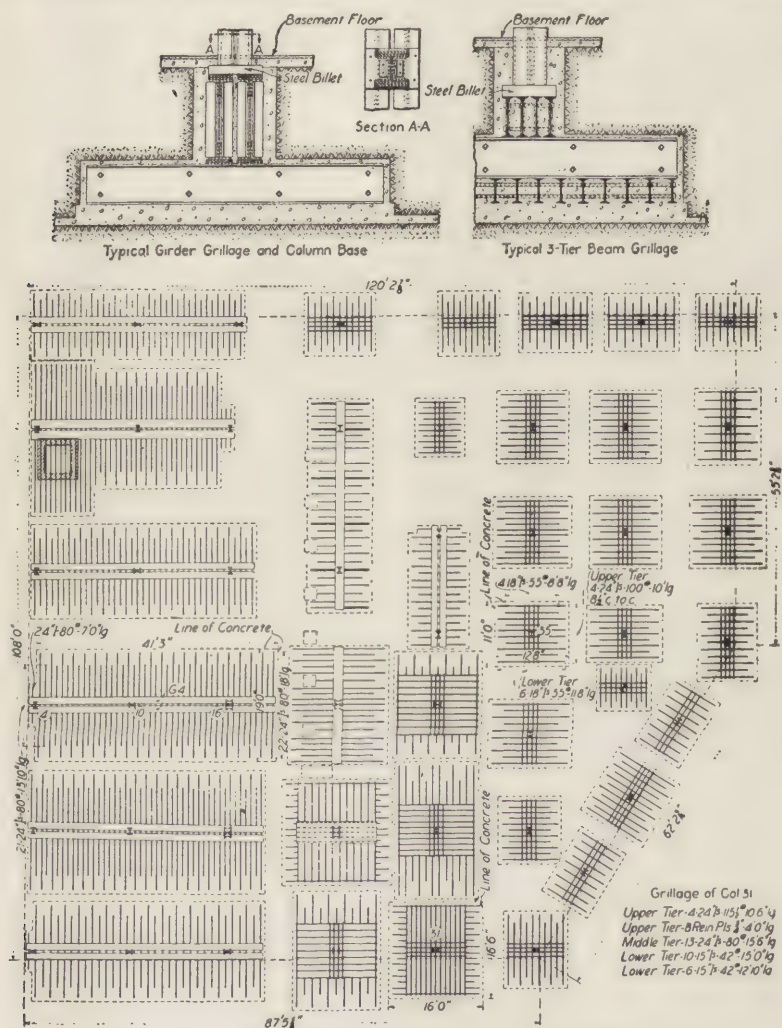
Grillage Foundation of the L. C. Smith Building, Seattle.
